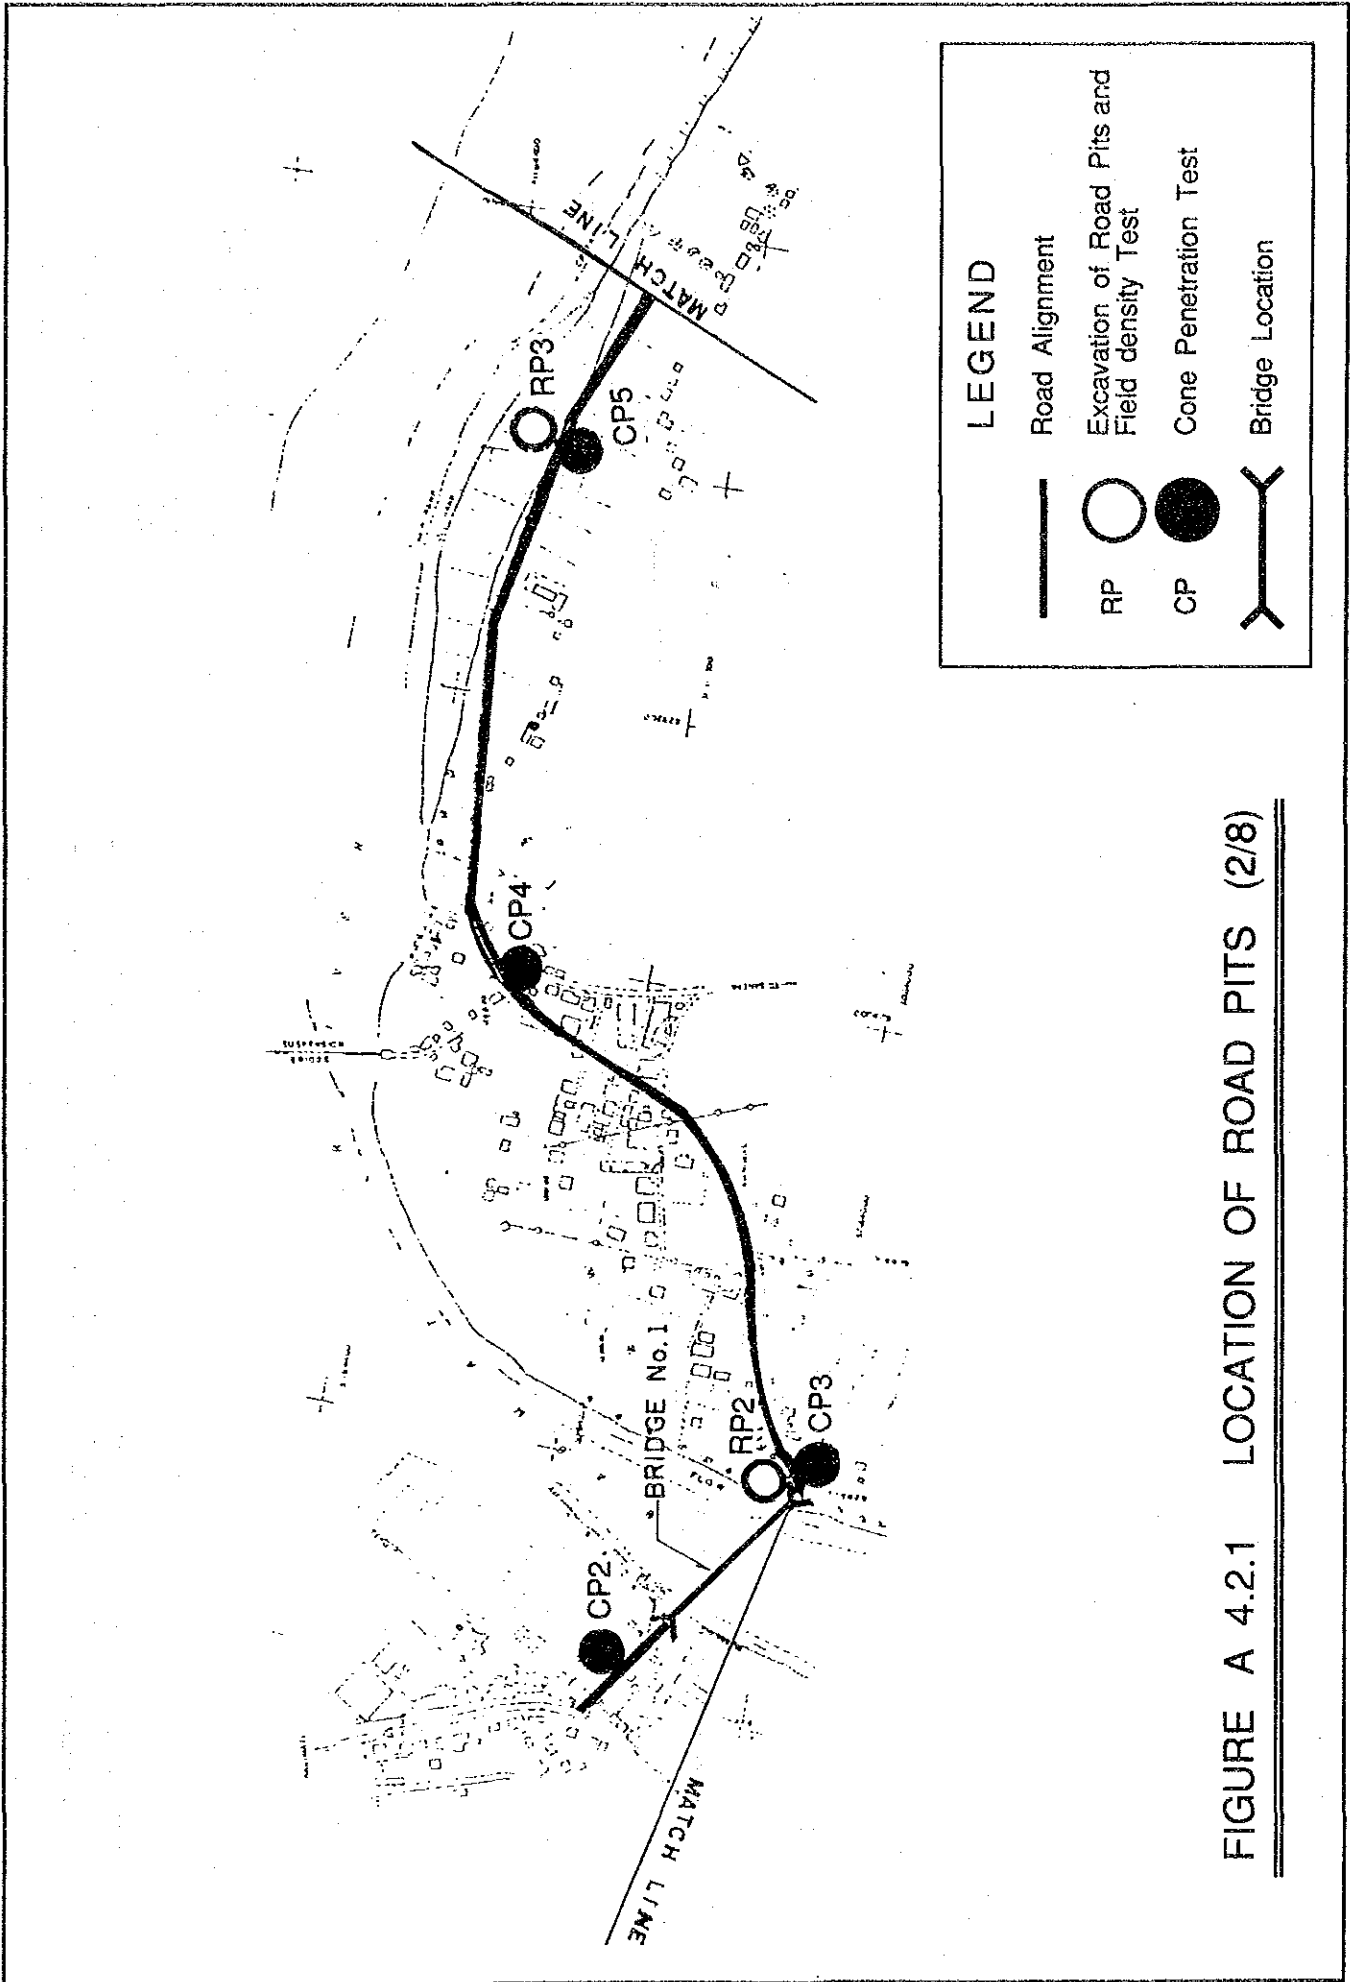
LOCATION OF ROAD PITS (2/8)
